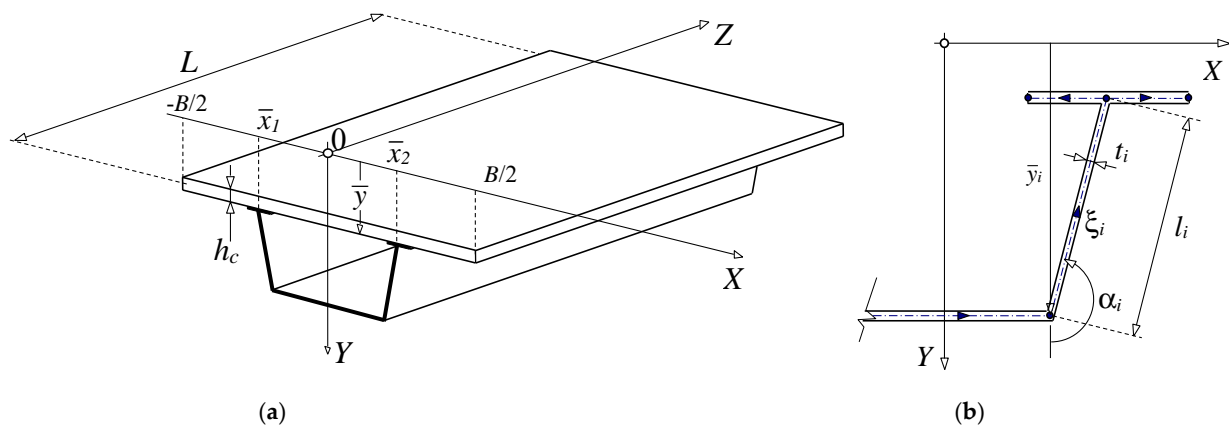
(a) Cross-section geometry; (b) local abscissa of the i -th wall.
